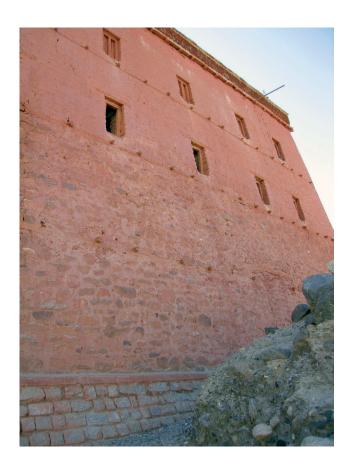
Phyang. Two storeys with stone walls topped with two storeys of adobe brick walls. Timber lacing at floor level carries the floor beams. Along the facade runner beams are connected to halving joints.
